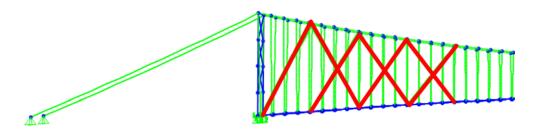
Vertical Bracing Pattern at Ends of 80 m Span Footbridge
